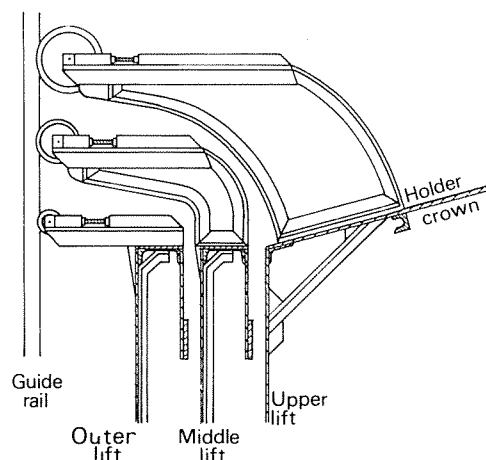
Typical arrangement of carriage rollers on a three-lift holder
